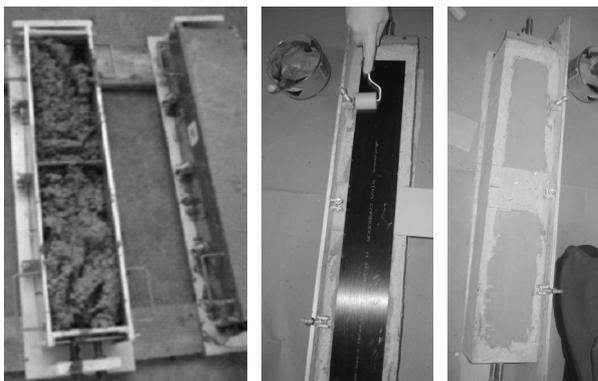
The specimen manufacturing / Confecționarea probei.
